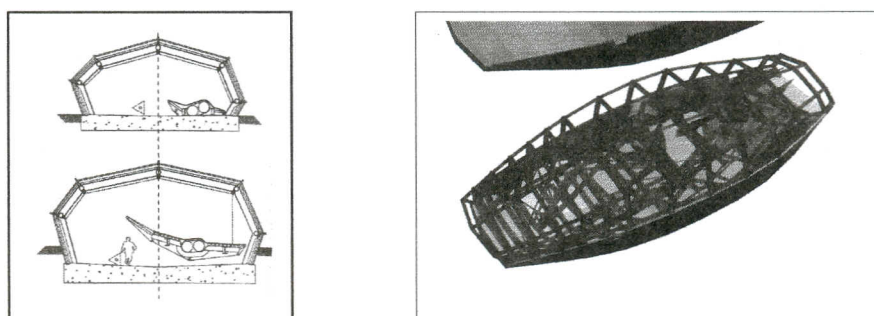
The structural system of saltwater pavilion (source: Ooesturhuis, 1998)
